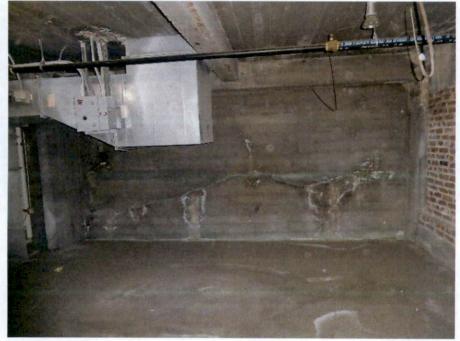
Horizontal cracking along exterior concrete wall – Tenth Floor.
